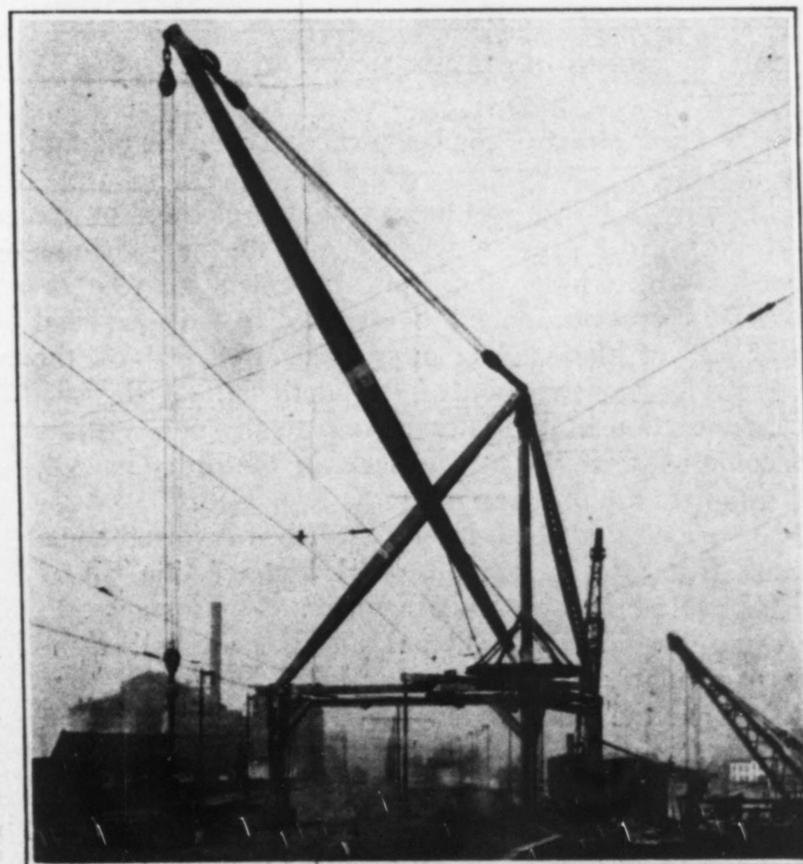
ERECTION DERRICK MOUNTED ABOVE STREET
